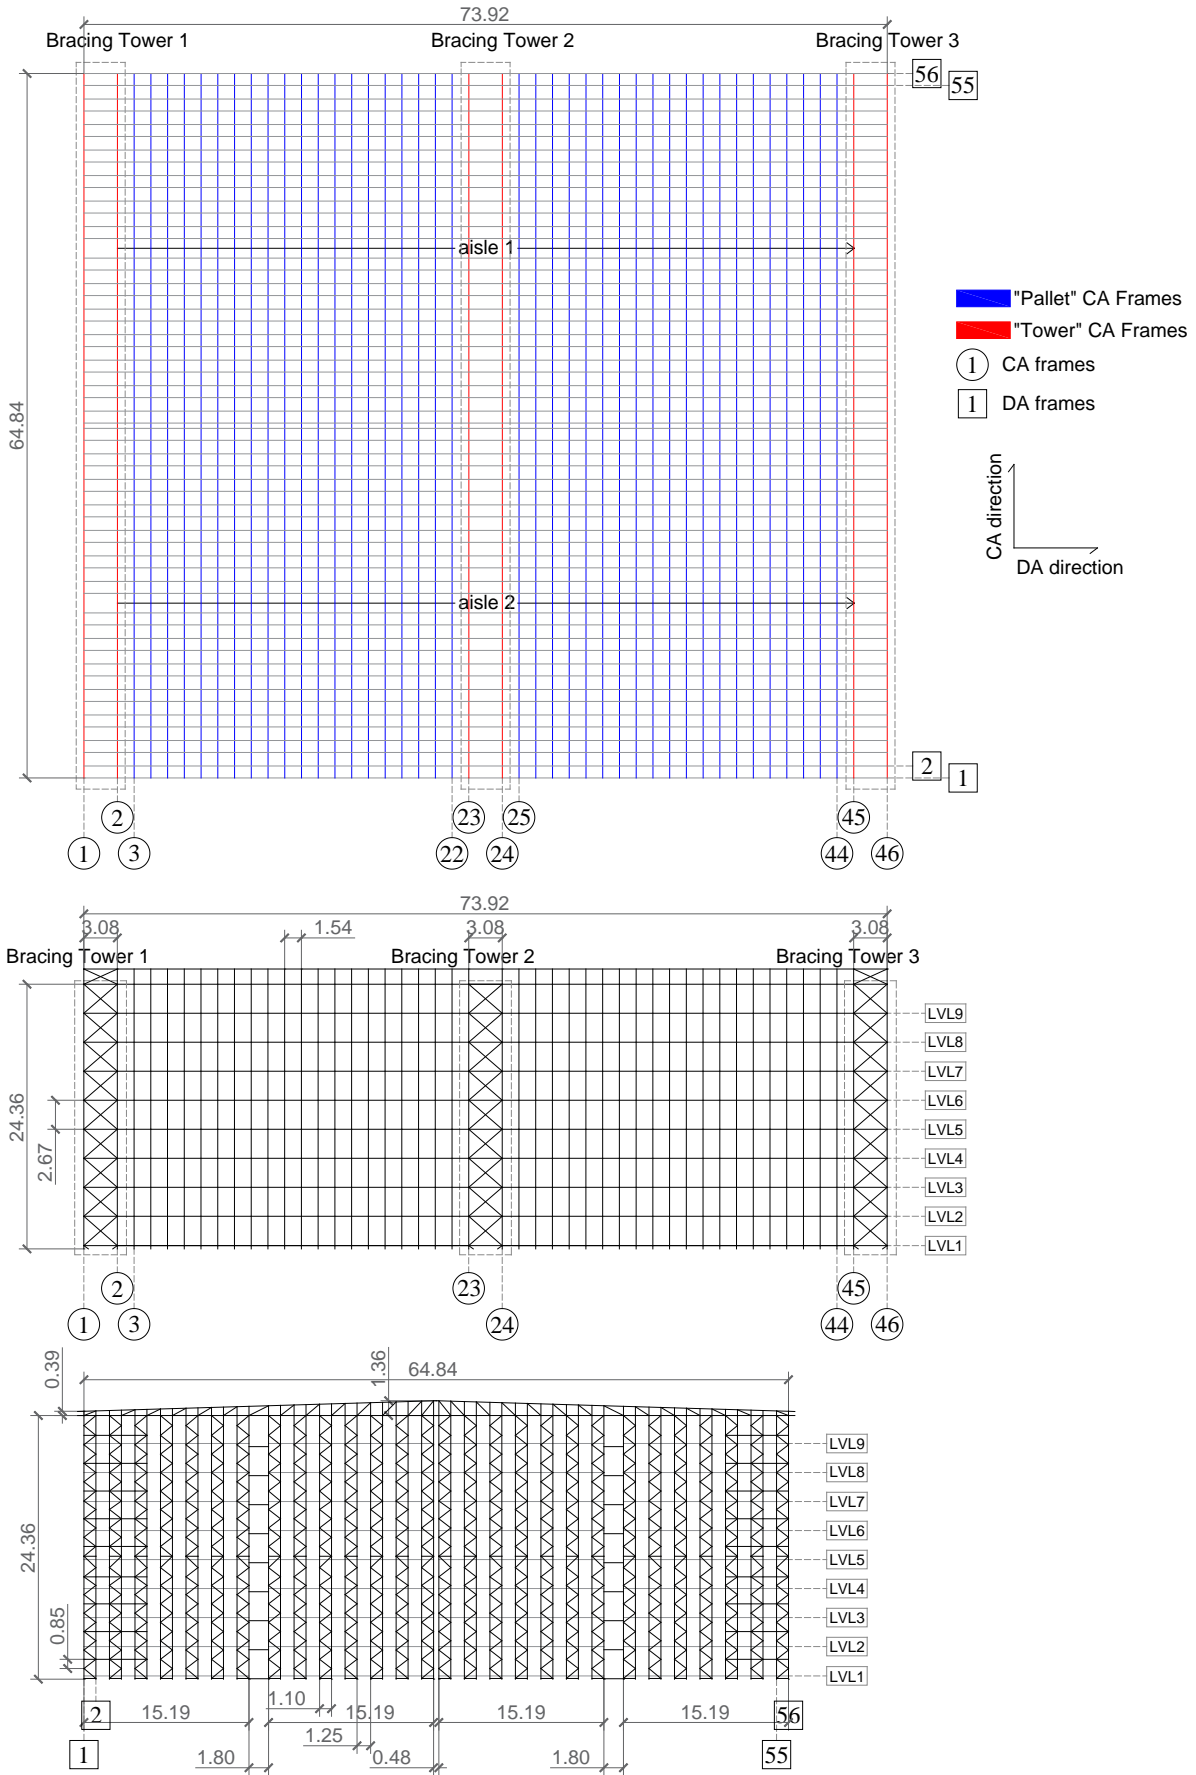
Structural configuration of CS3, showing plan, down- and cross-aisle views.
